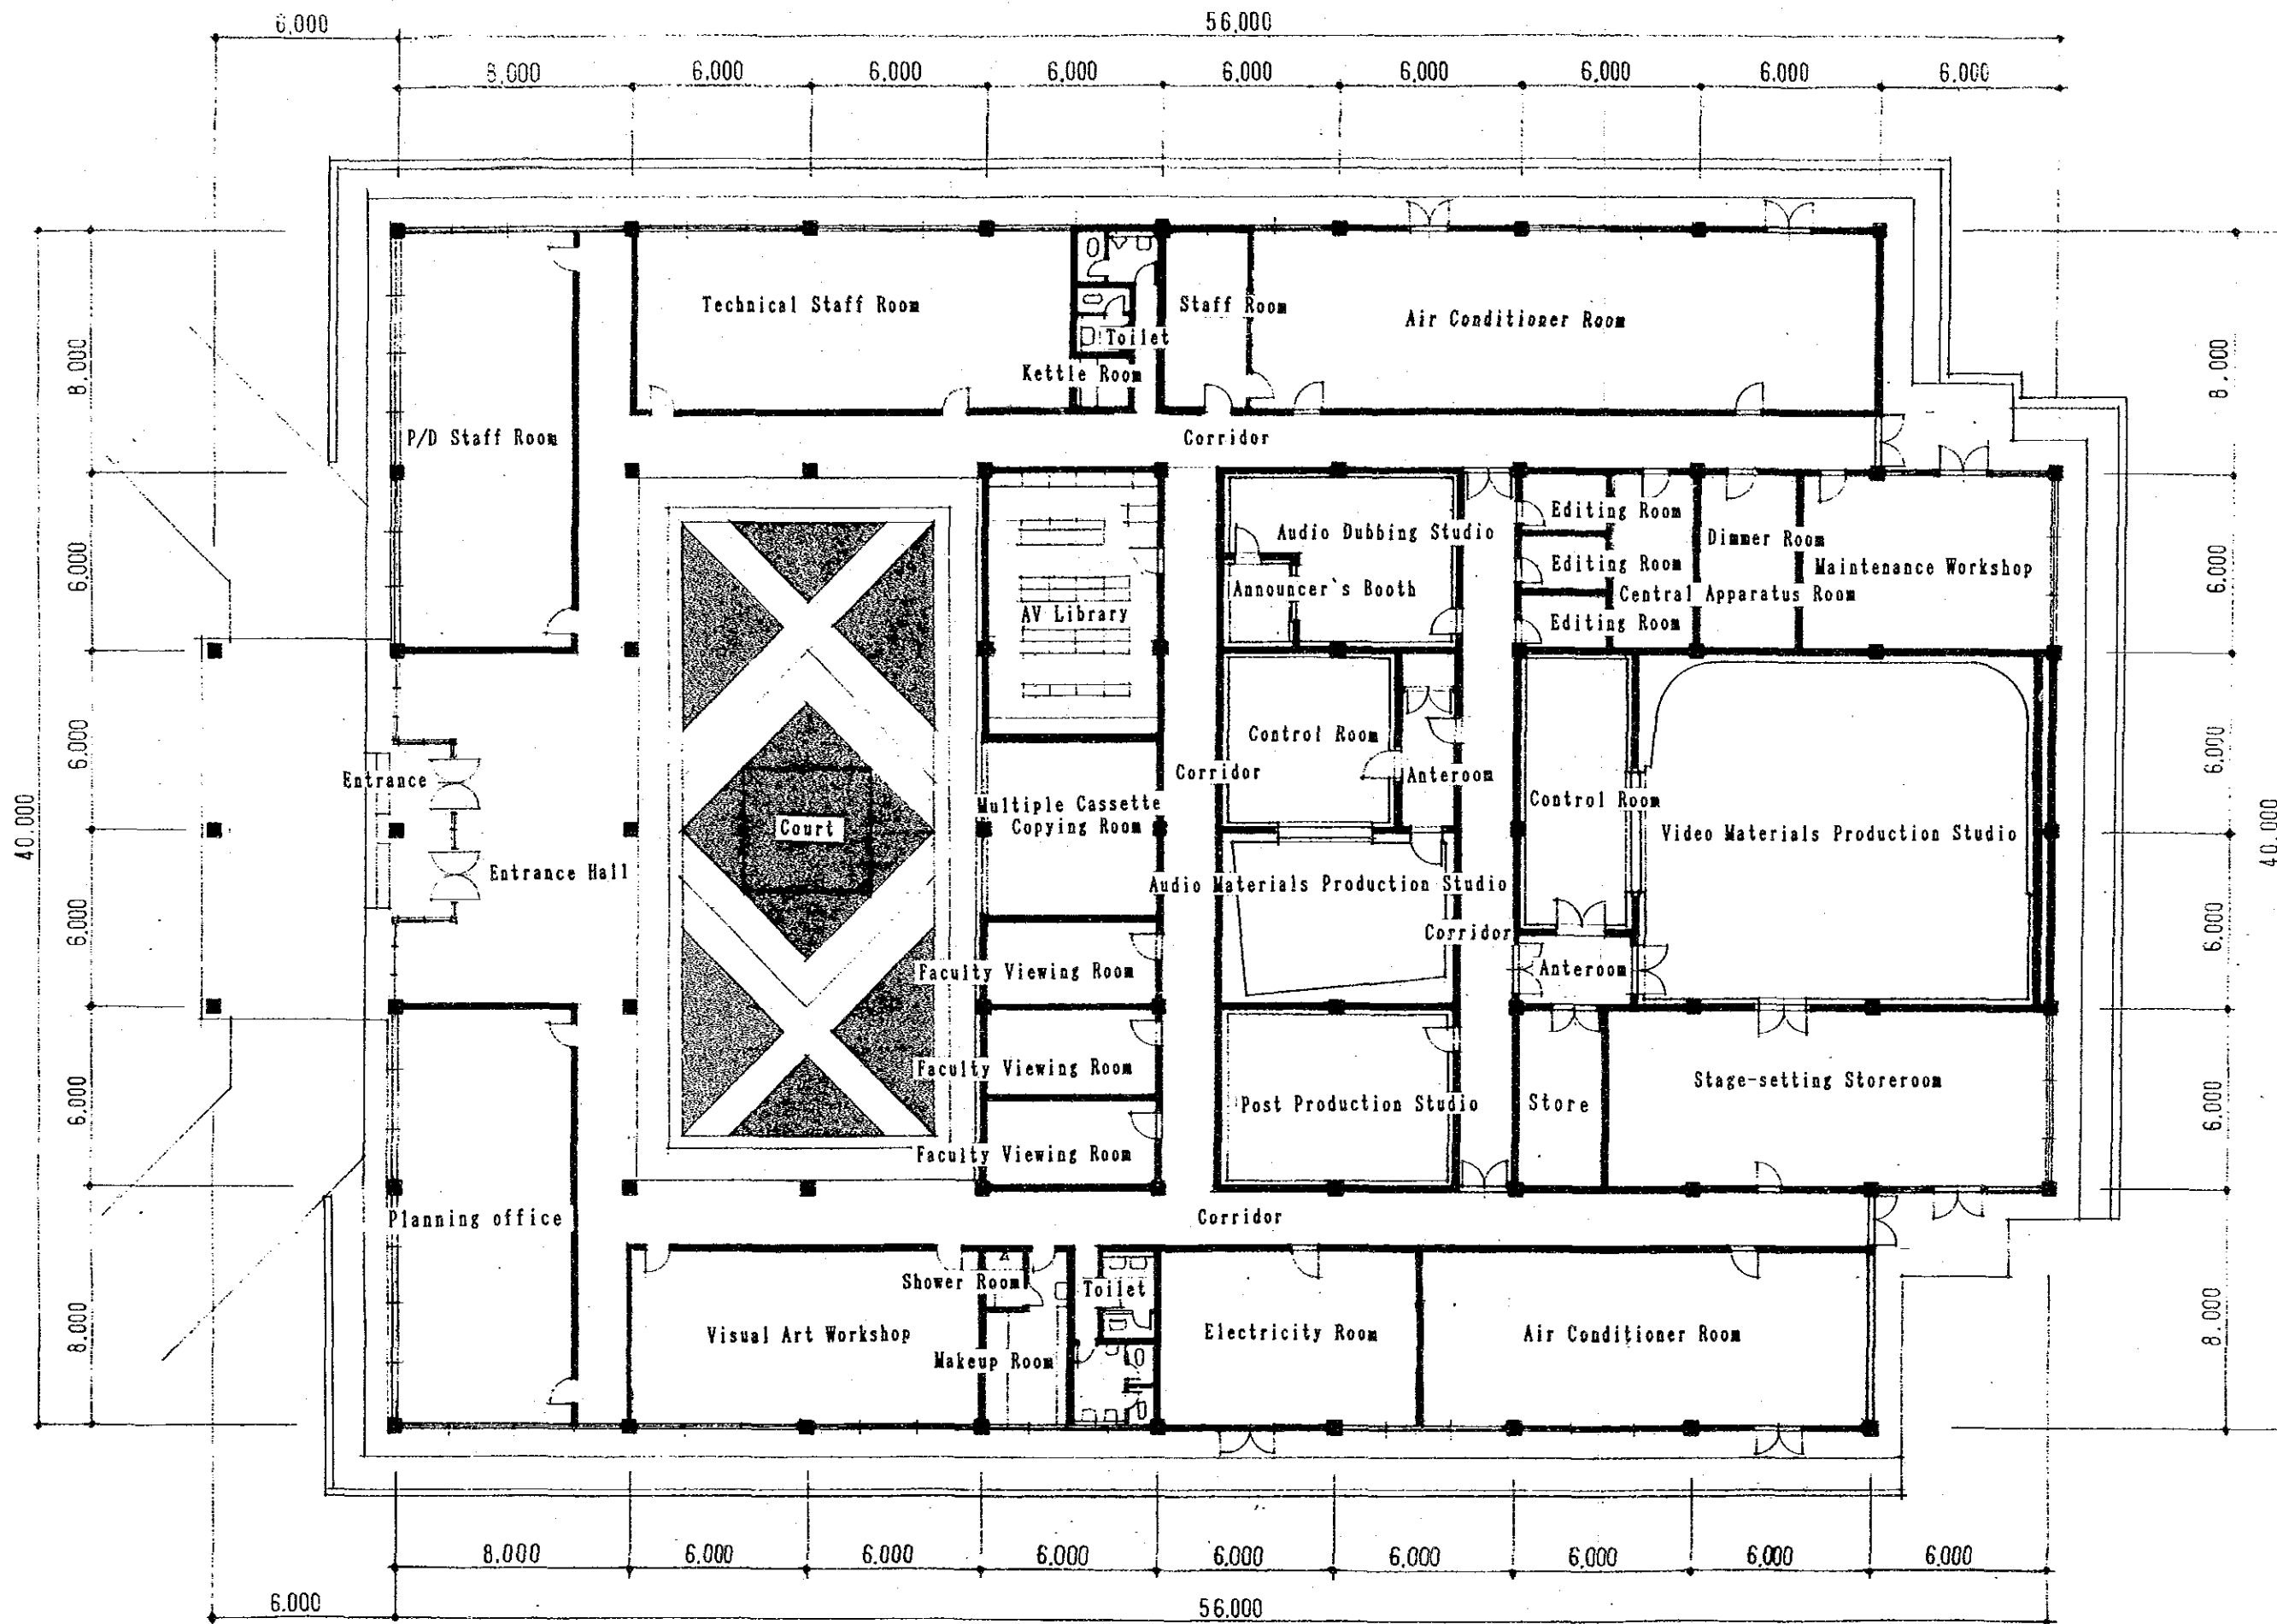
FLOOR PLAN OF THE AV EDUCATION CENTRE 1:200
